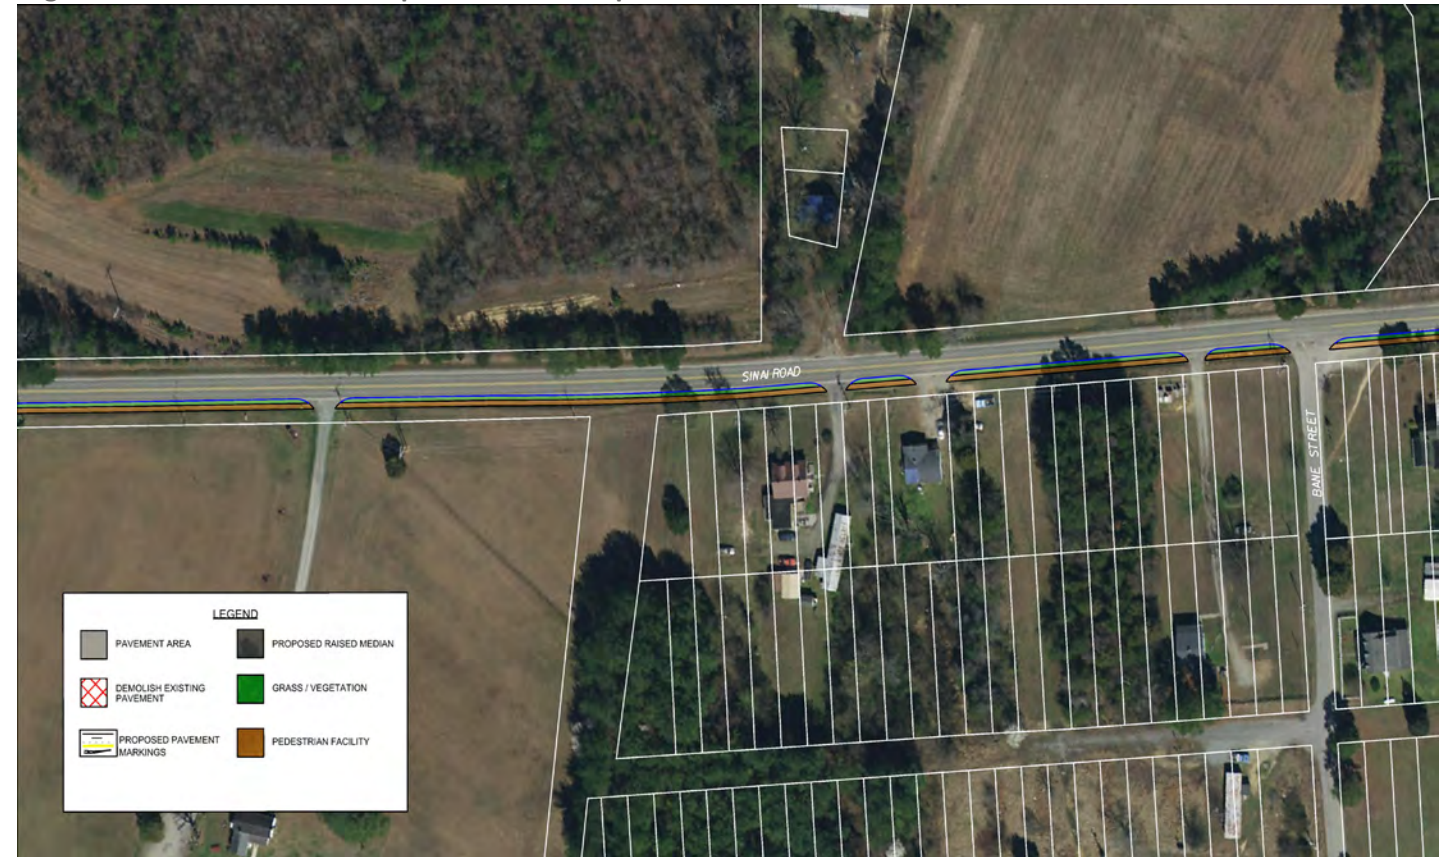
Sinai Rd Sidewalk Improvement Concept C
